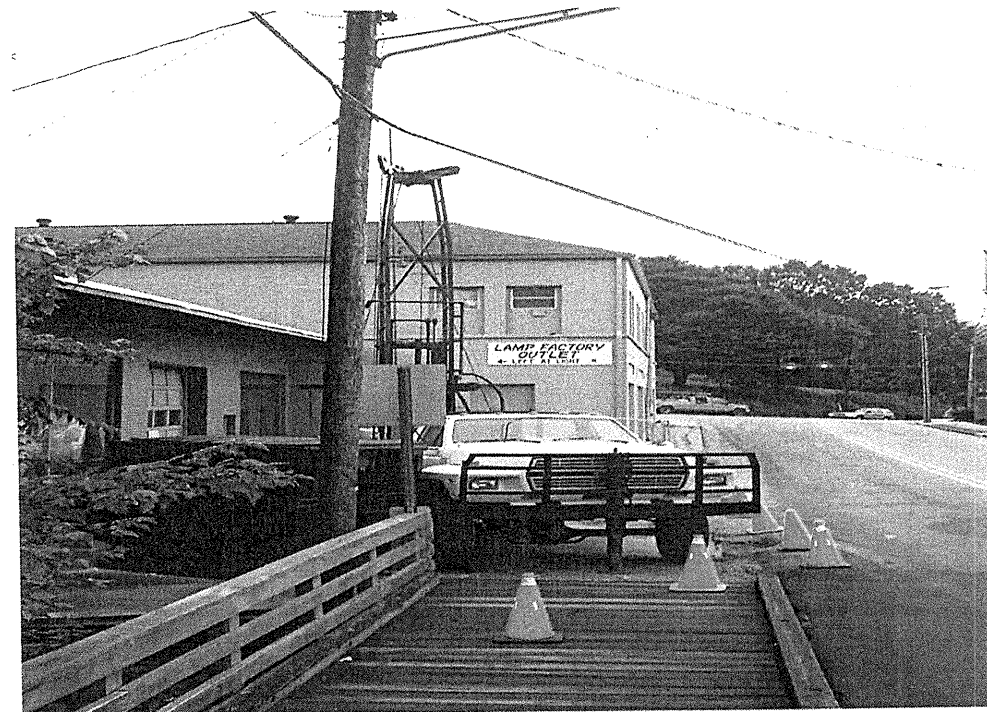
View Along Right Side of Existing Bridge Looking Upstation
